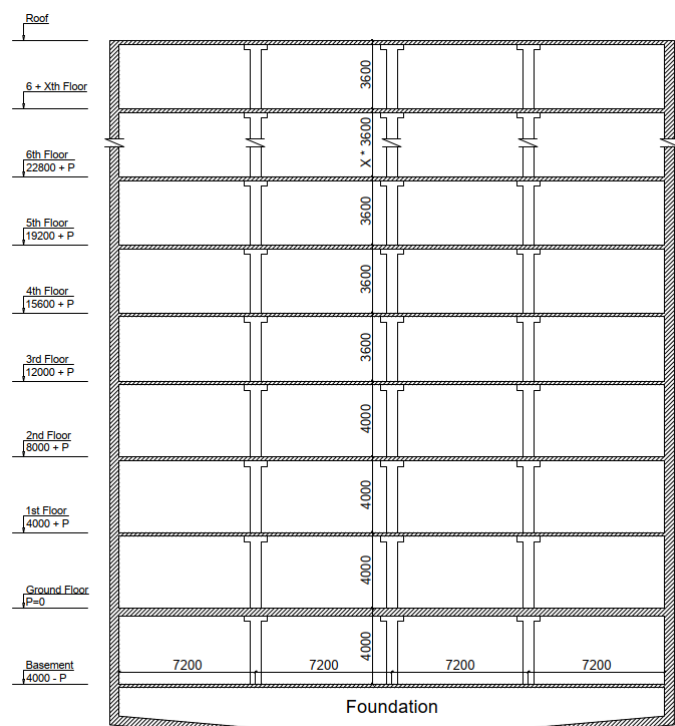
Mock building cross-section (enlarged version can be found in Appendix A2)
